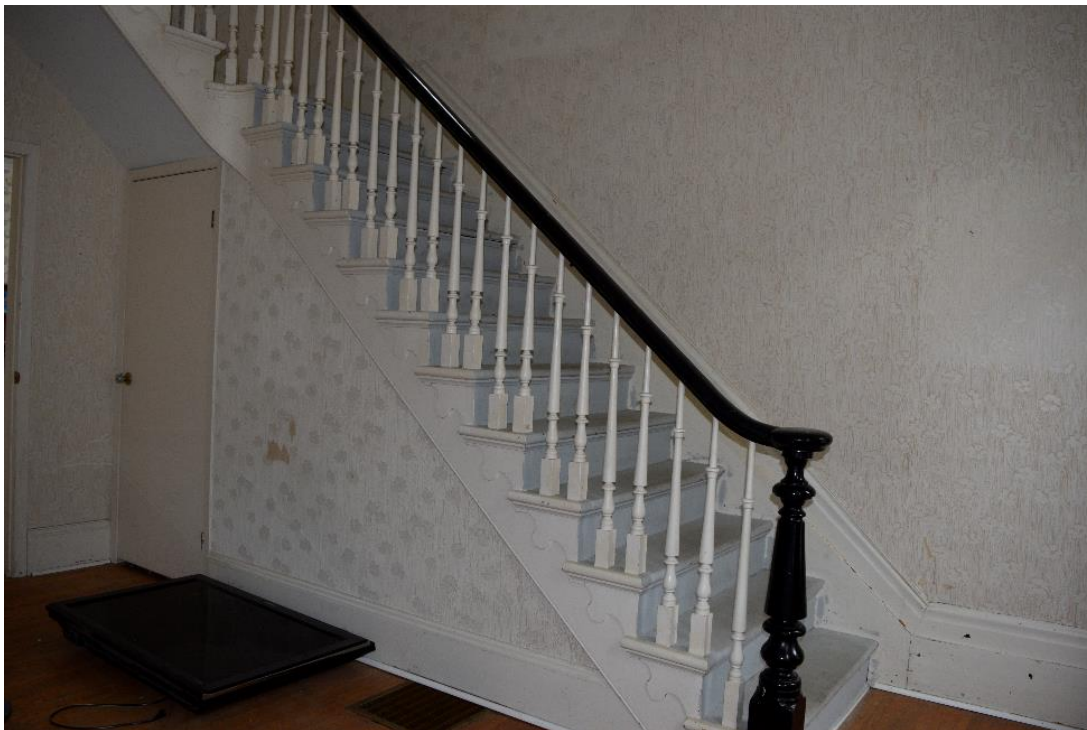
Original staircase in original structure, note replacement door under stairs and presence of original baseboard, facing west
